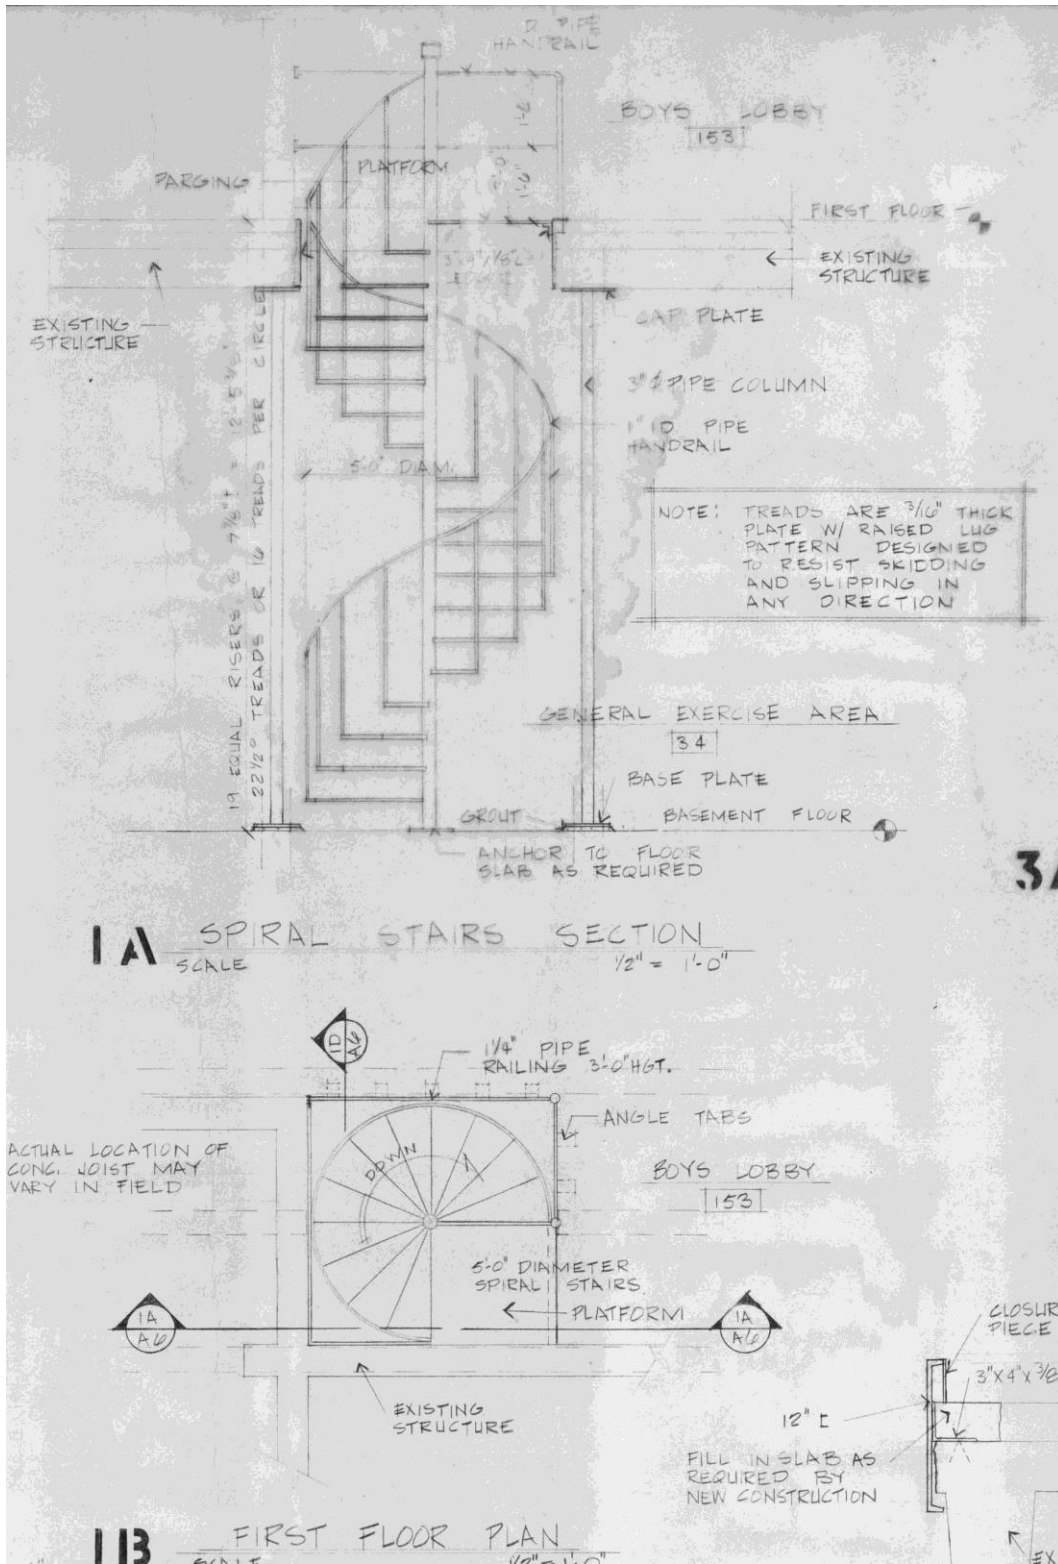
Spiral Stair plan and section, Springfield YMCA Renovation (Maslauski, Litvan and Berstein 1975; Sheet No. A5).
